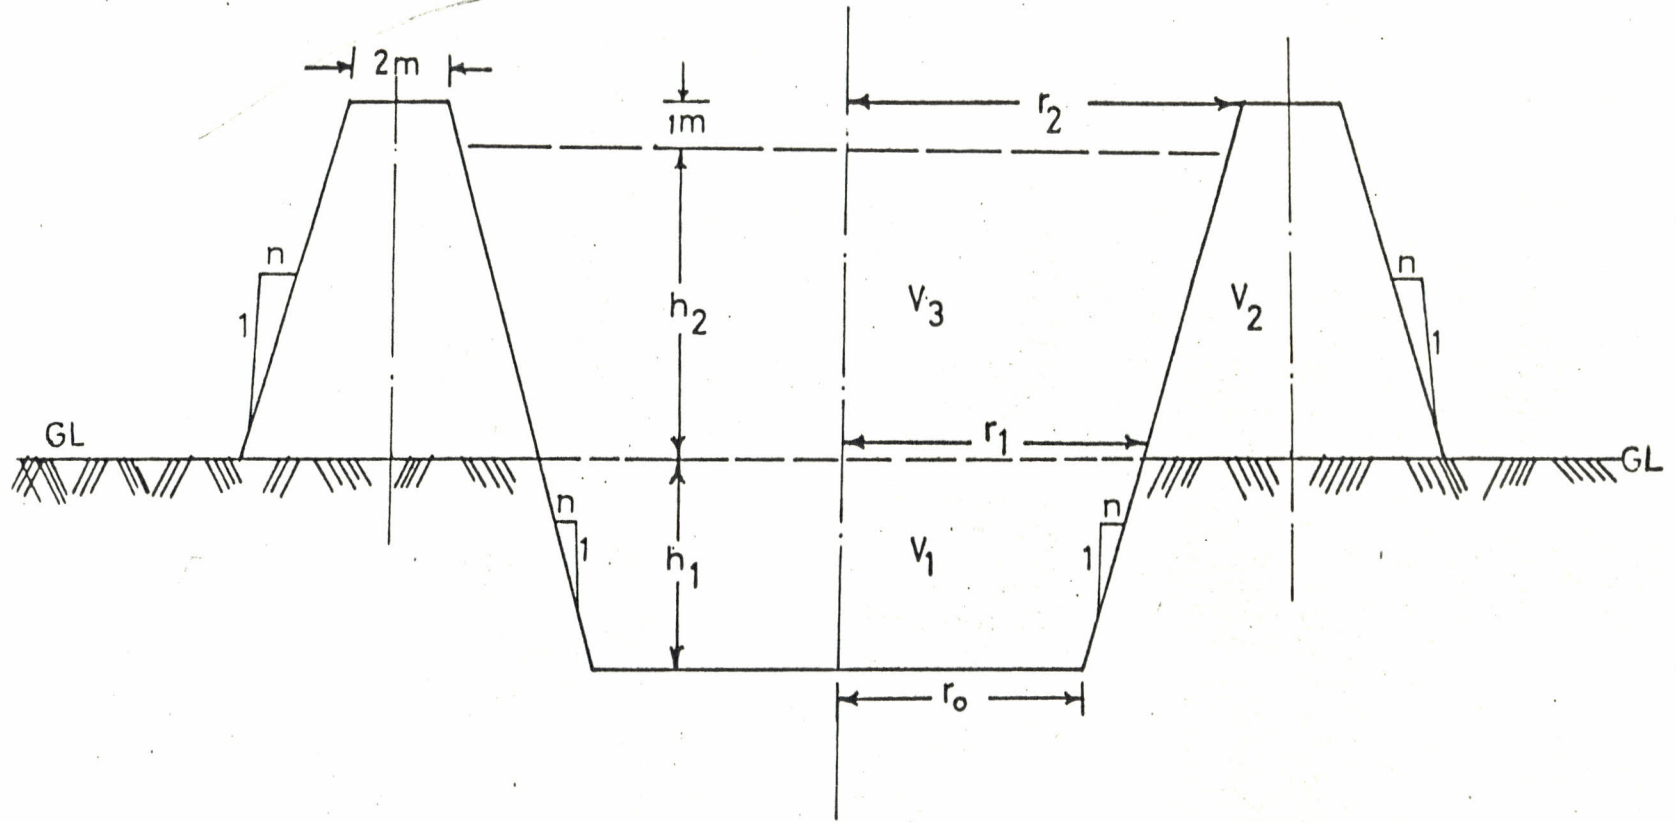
Hypothetic cross sectional sketch of a truncated cone shaped tank.
